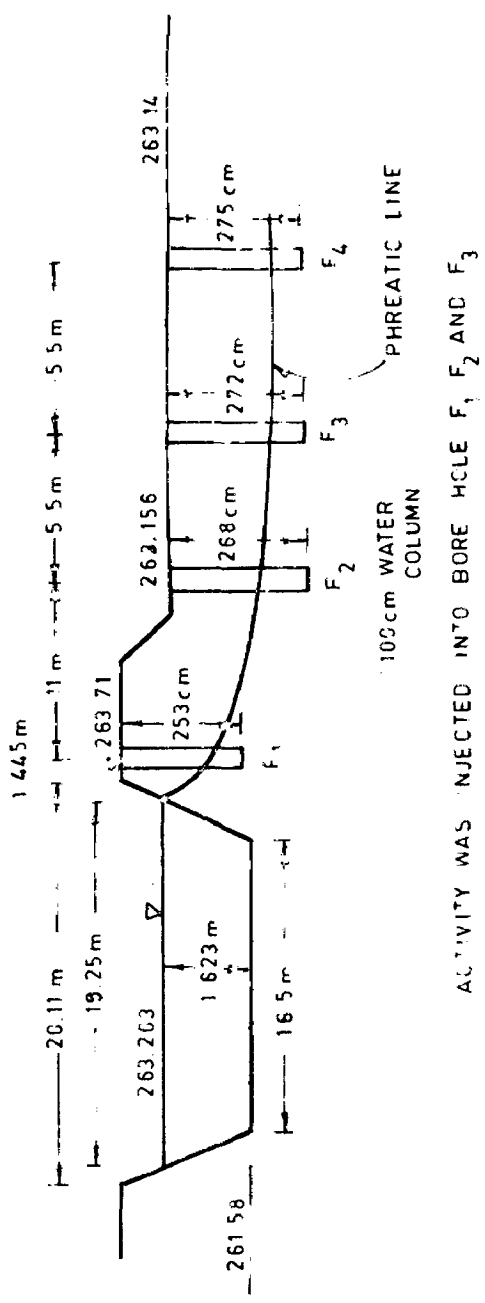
DEOBAND BRANCH CROSS SECTION (1M-4F)
